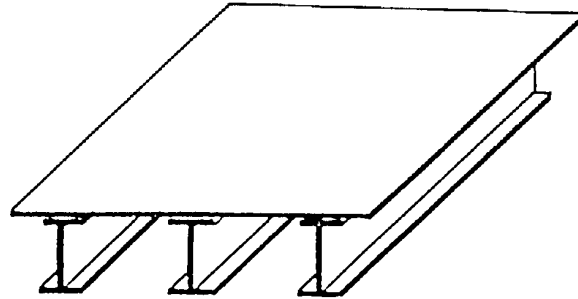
A steel plate reinforced by equidistant steel stiffeners.
